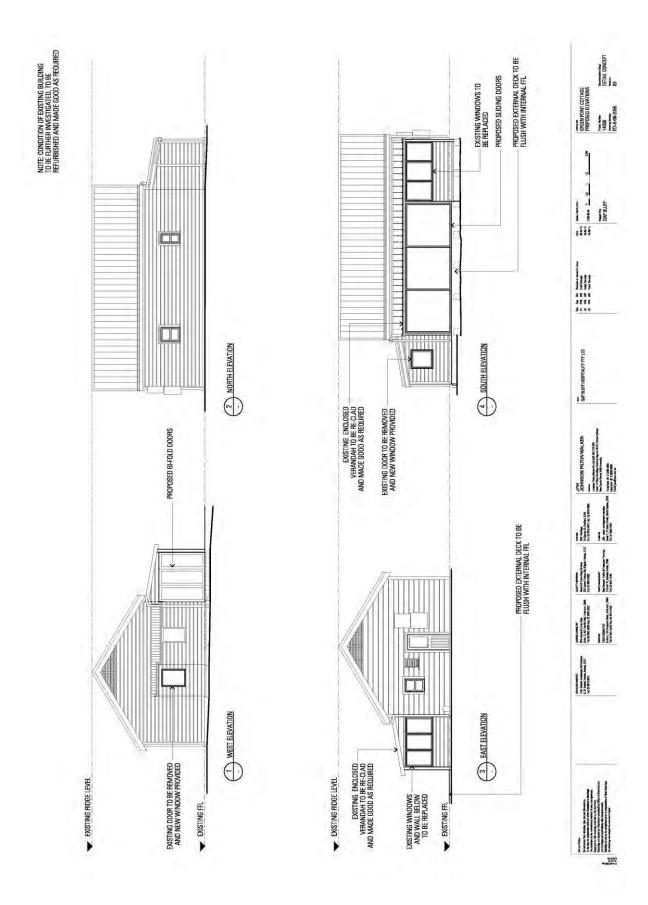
Proposed elevations for Green Point Cottage. (Source: JPW 2015)
